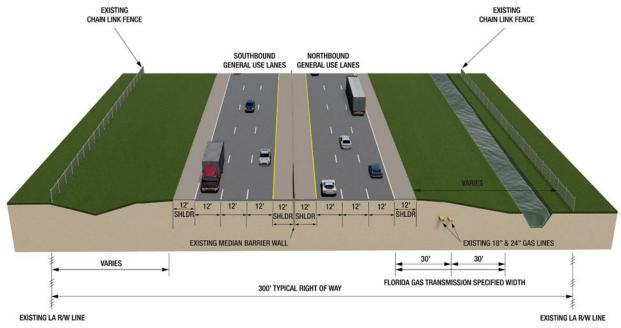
Existing Typical Section from South of Atlantic Blvd. to Wiles Rd.
